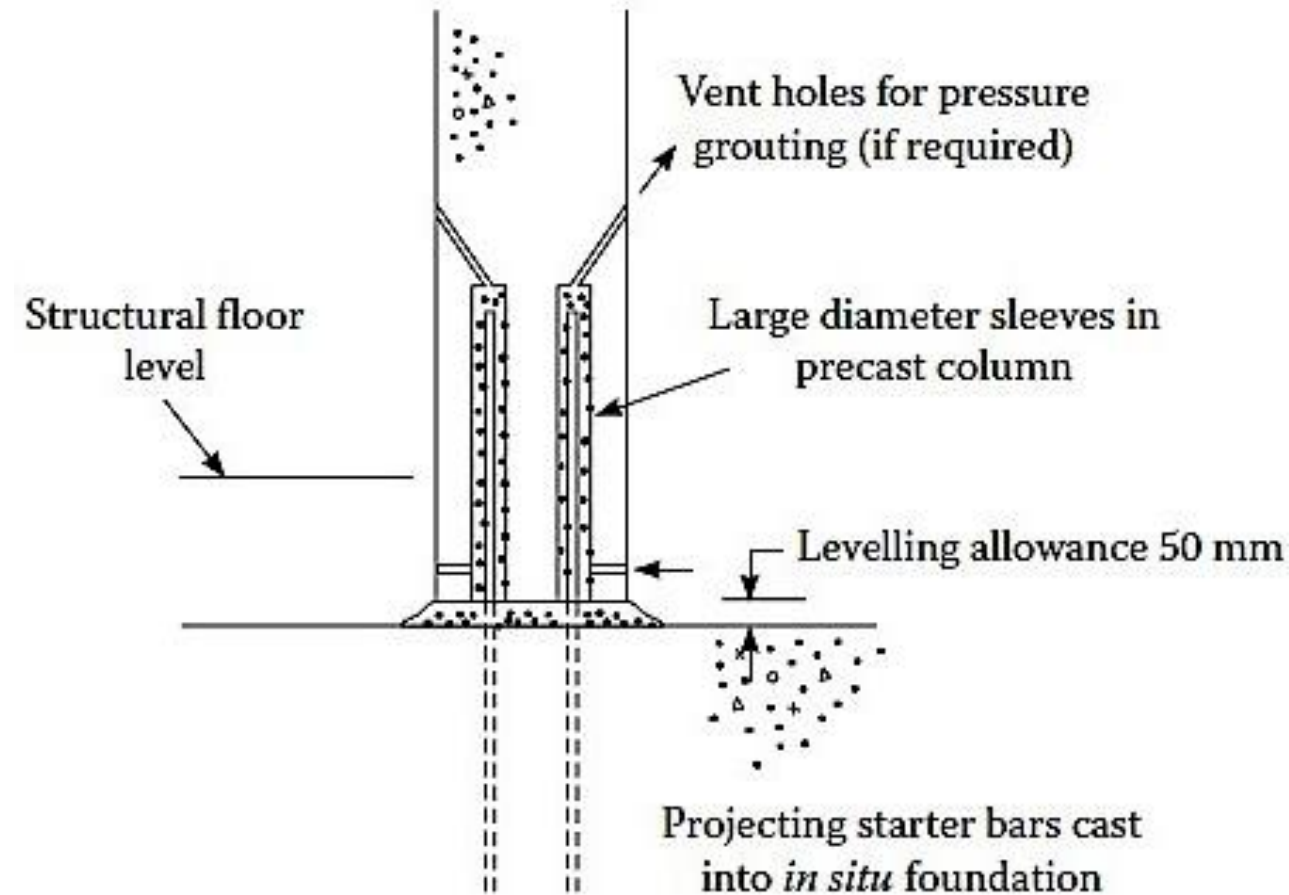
Column-to-foundation or column-column splice using grouted steel sleeves.
